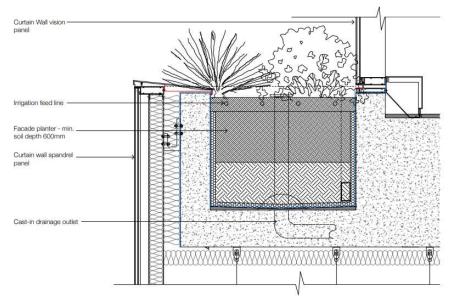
Façade planter and drainage detail (DRP No. 9) (19 March 2021)
